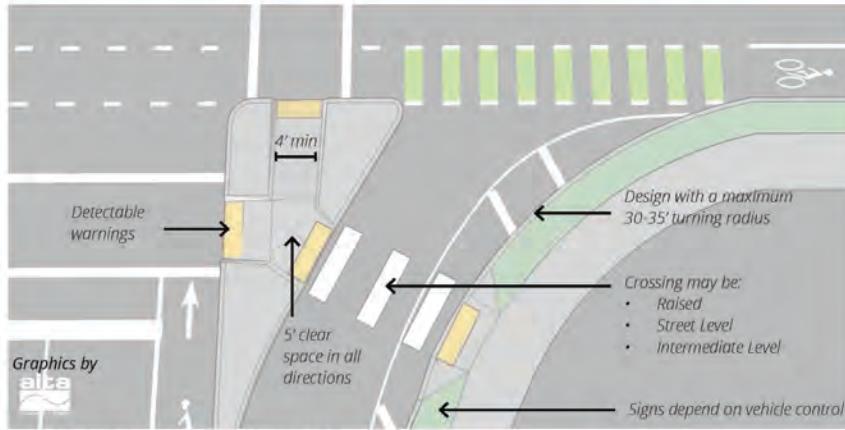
CHANNELIZED RIGHT TURN LANE - OVERHEAD VIEW
